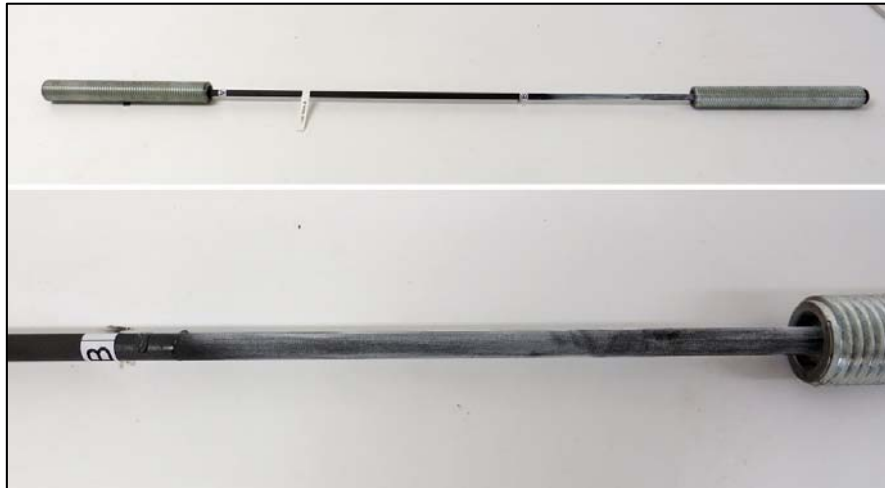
Typical failure surface in the bonded anchorages with CFRP under fatigue loading.
